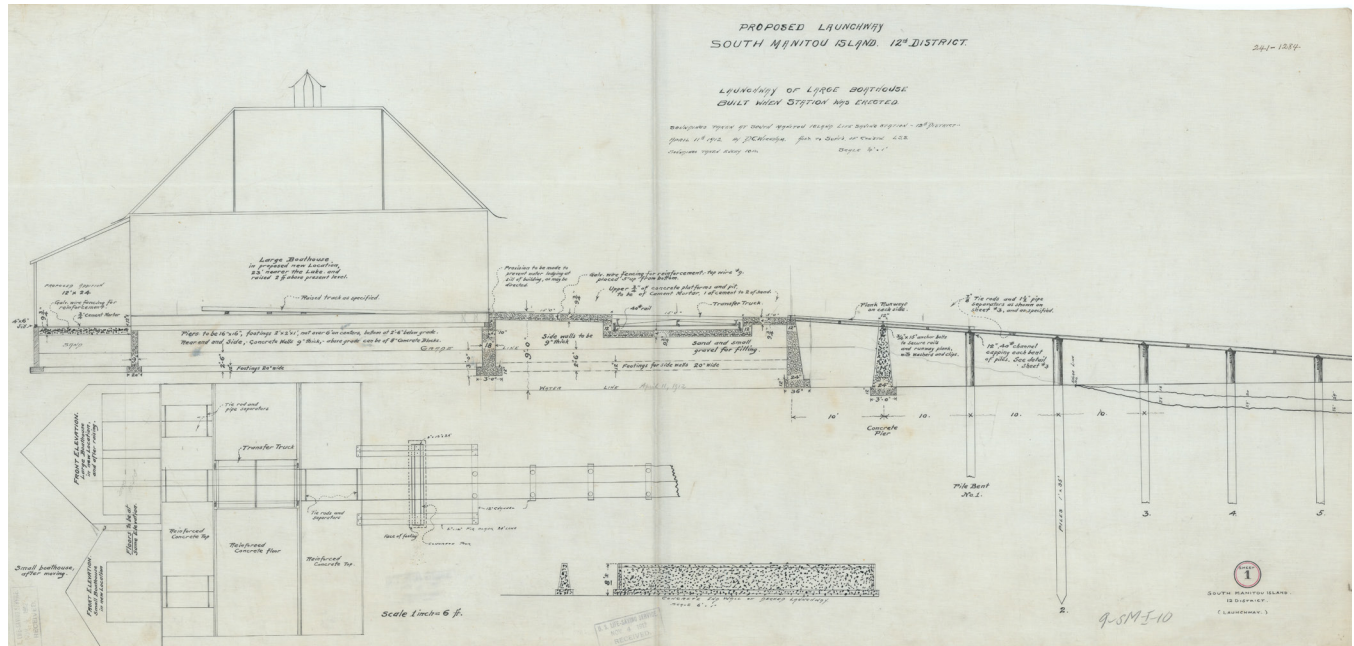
USLSS plans for a new incline and tracks at Boathouse #1 (source: National Archives, 1912).
